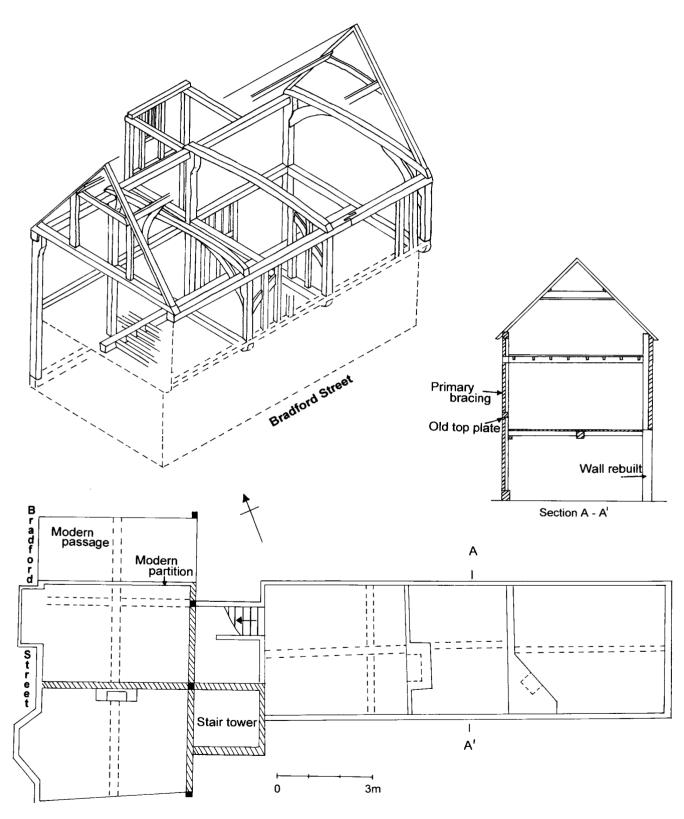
Bocking, 92 Bradford Street. Ground plan, with an isometric drawing of the timber frame on the frontage and a cross-section through the rear extension
